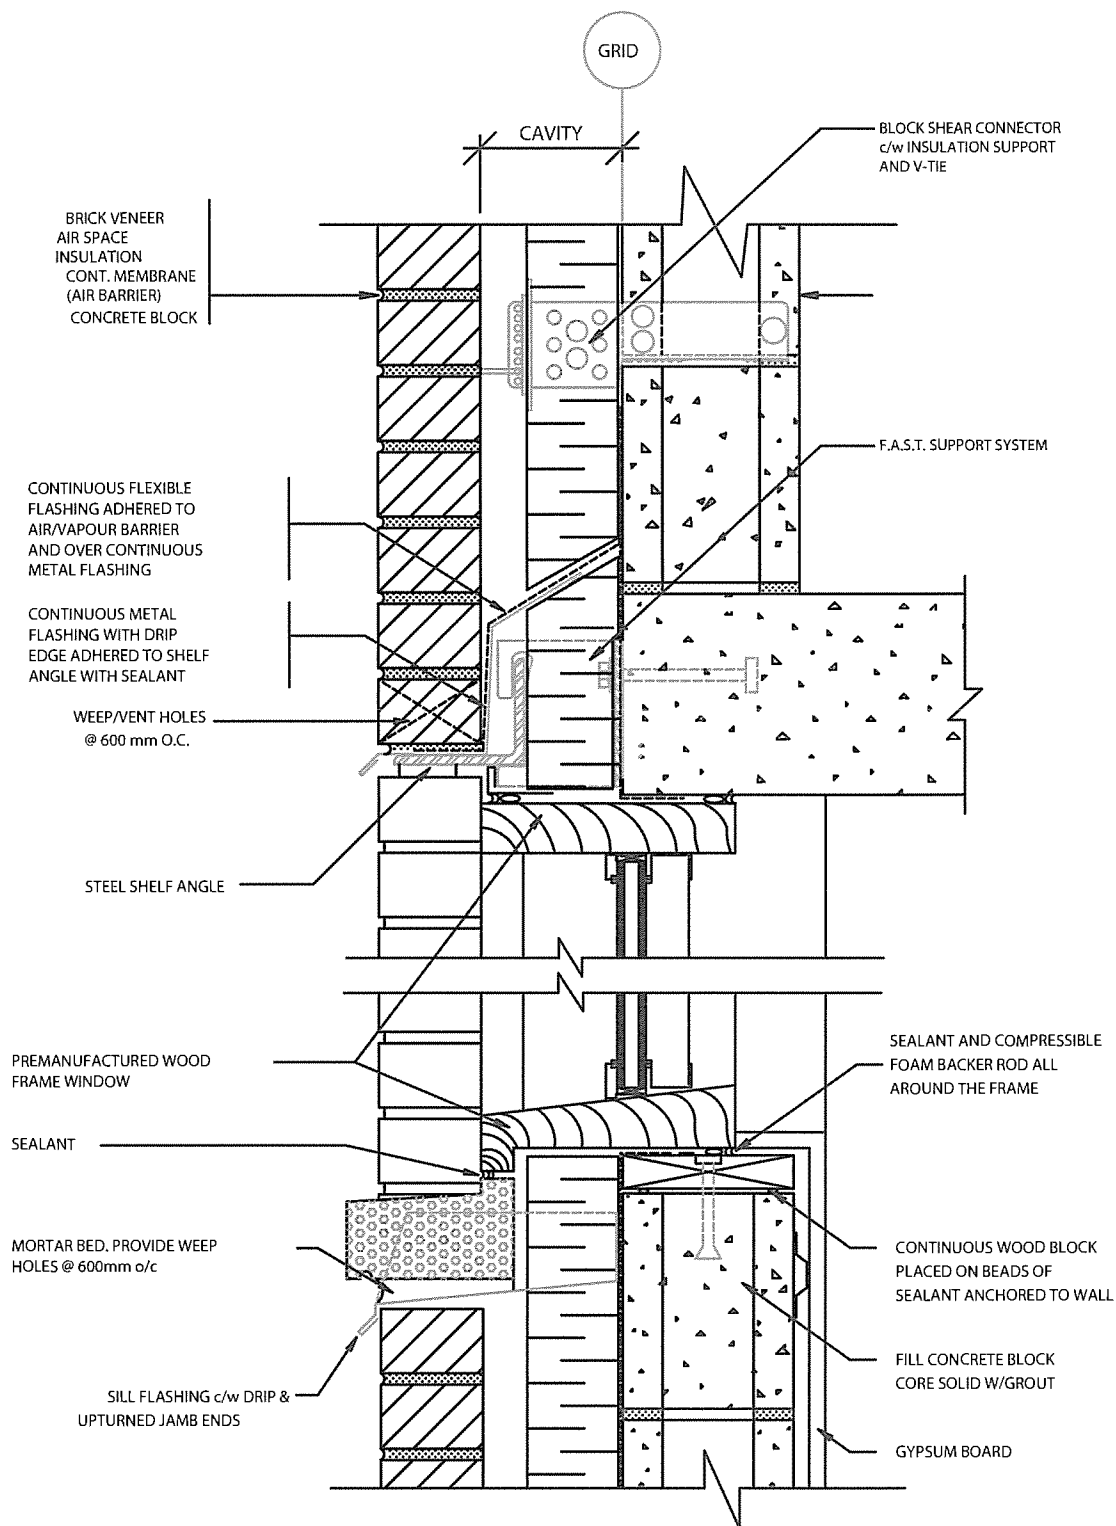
BRICK VENEER / CONCRETE BLOCK - WOOD WINDOW HEAD & SILL DETAIL
